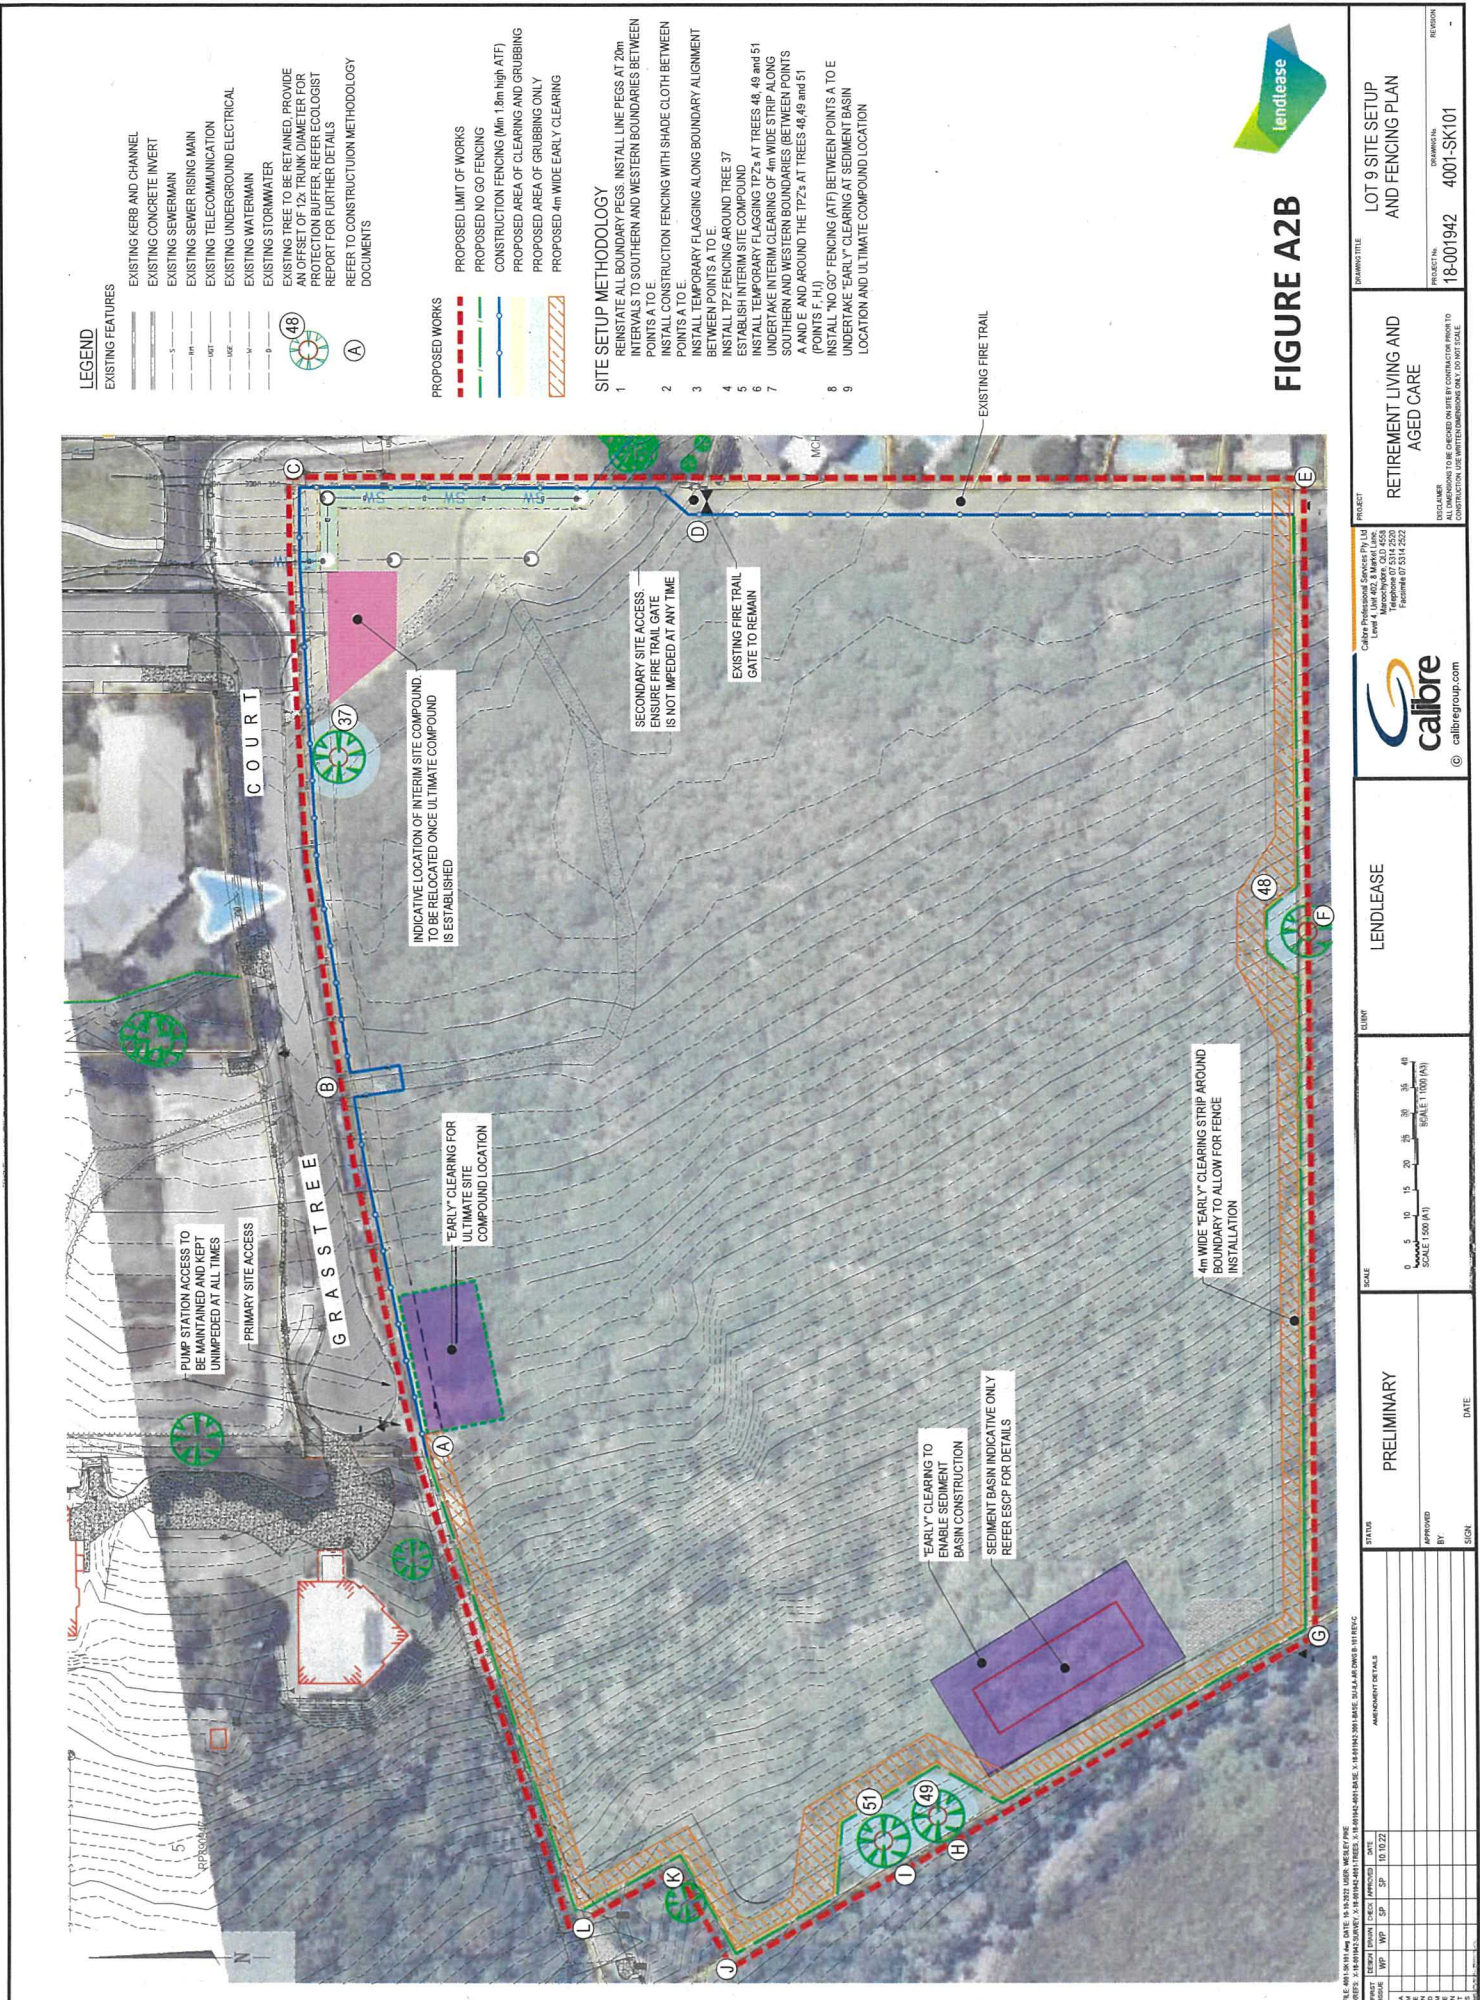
B: LOT 9 SITE SETUP AND FENCING PLAN
